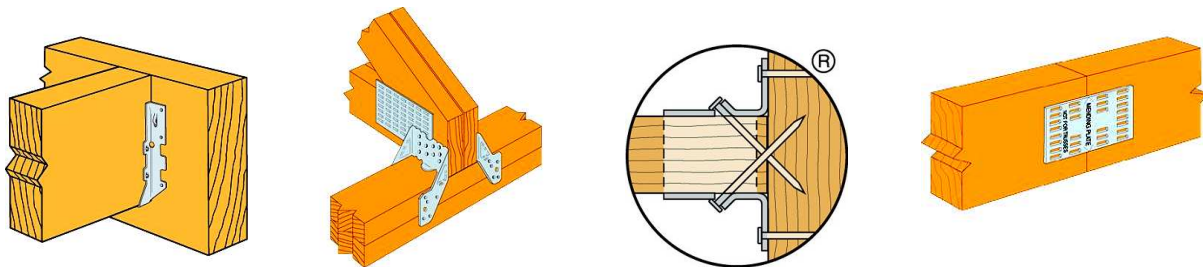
Jointing methods (Source: <http://www.strongtie.com/products>)
